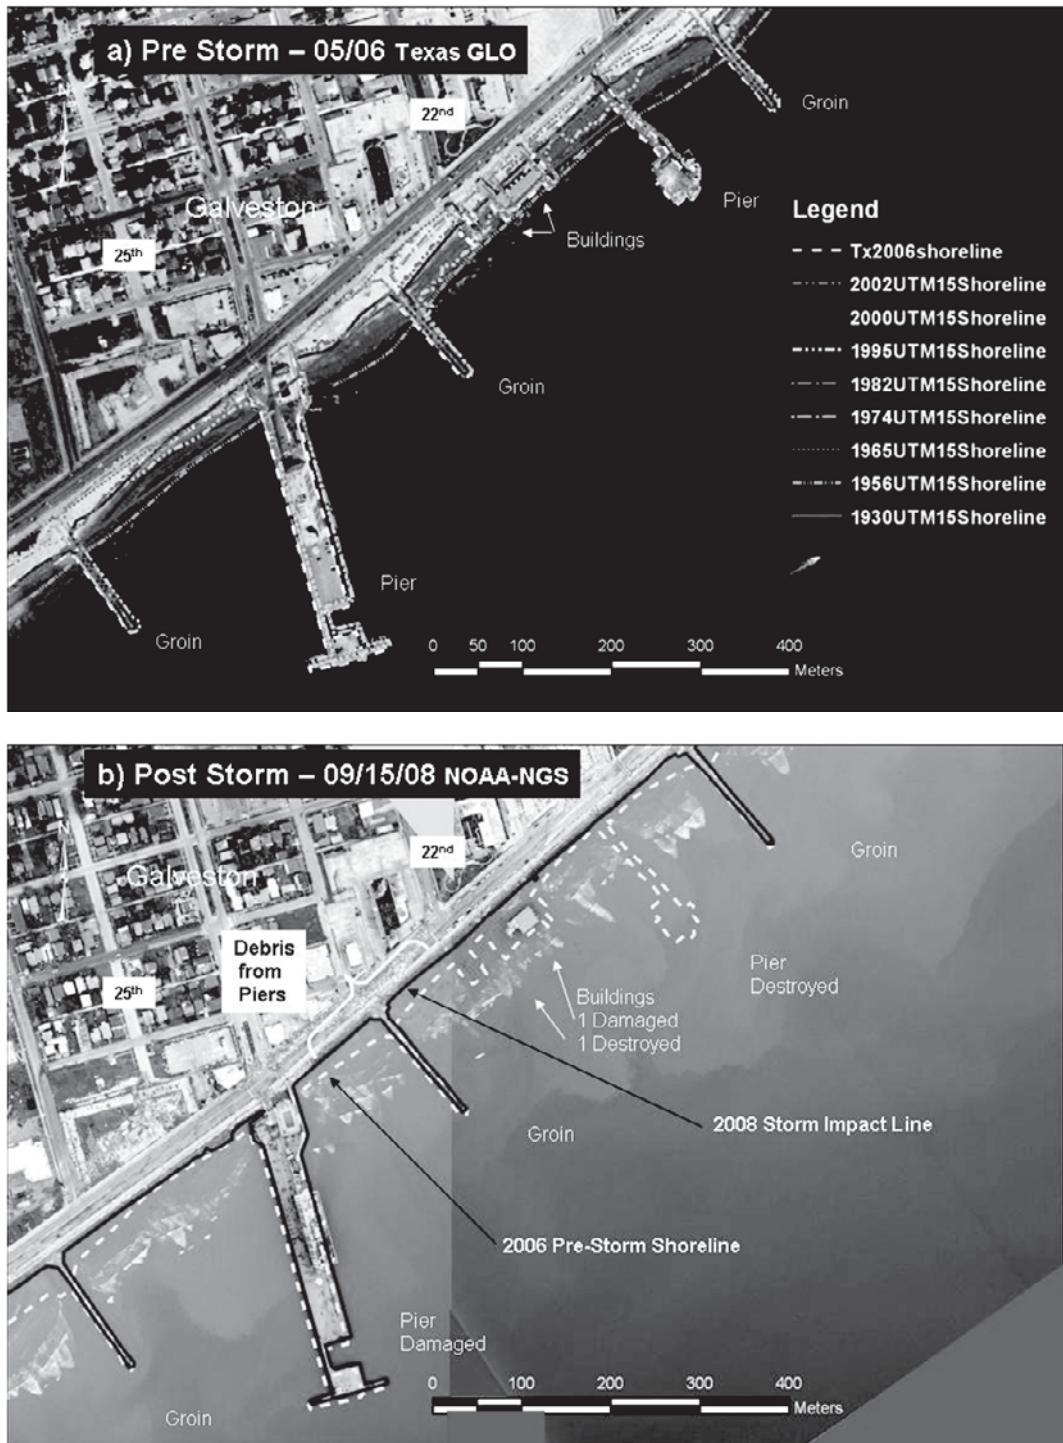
(a) Pre-storm aerial photography of the Galveston Seawall area between 21st and 26th streets showing location of piers, groins, and historic shorelines and (b) post-storm impacts of damaged and destroyed piers
